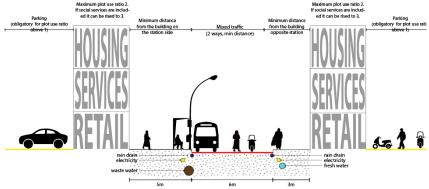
The new cross section of the road at the bus station area. The grayed-out buildings are not part of the plan but might occur if the market allows.
